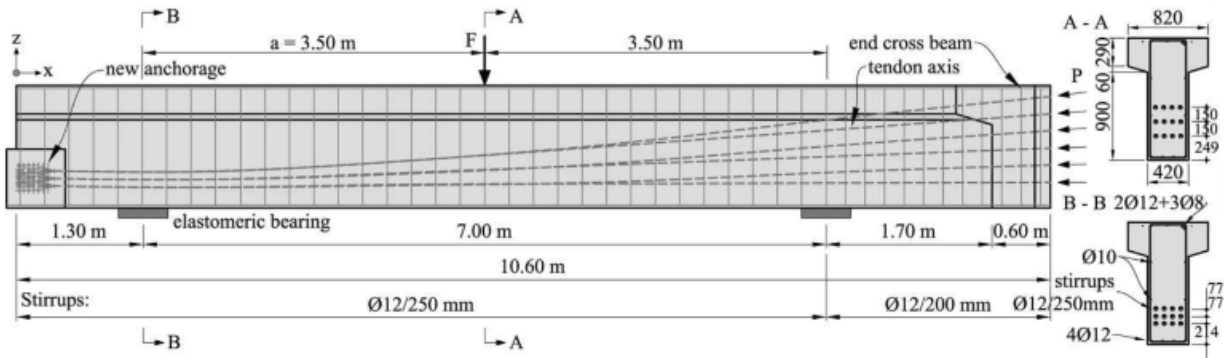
Reinforcement and tendon layout in the girders and schematic of the test setup (Melk east overpass bridge girder).
